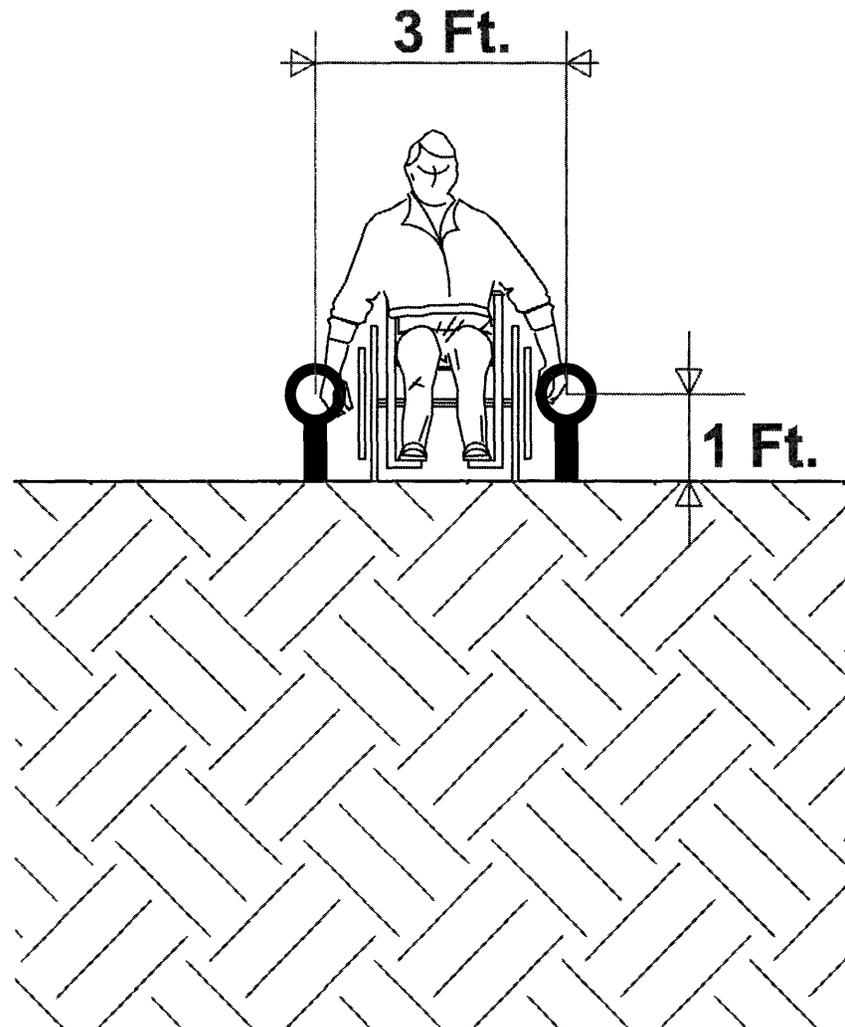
Detail showing a wheelchair user and one possible handhold arrangement
